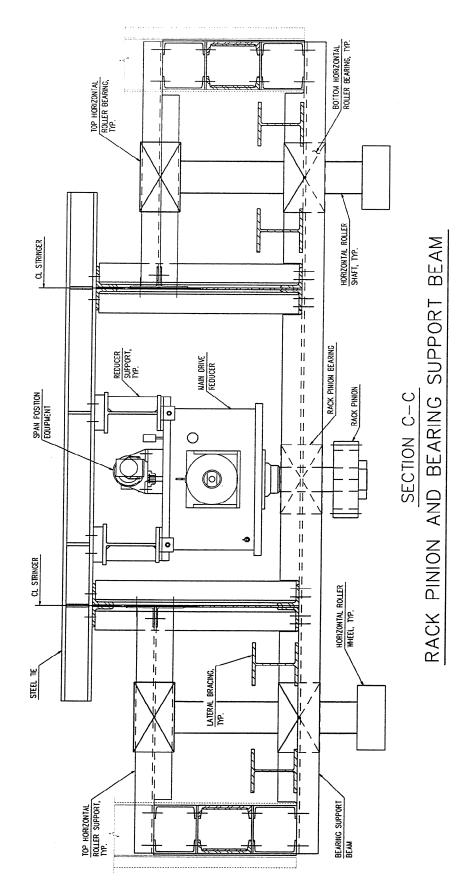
Cross Section View of the Bearing Support Beam and the Main Drive Reducer Support Frame
